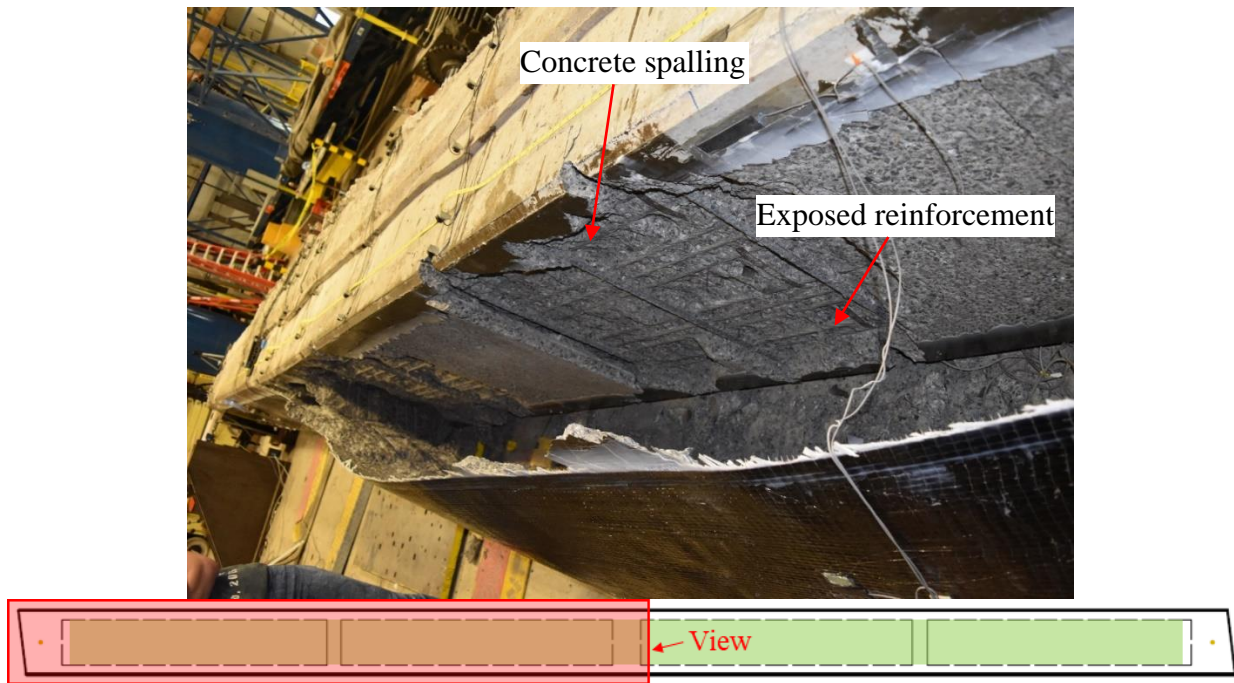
Concrete spalling at the maximum moment zone
